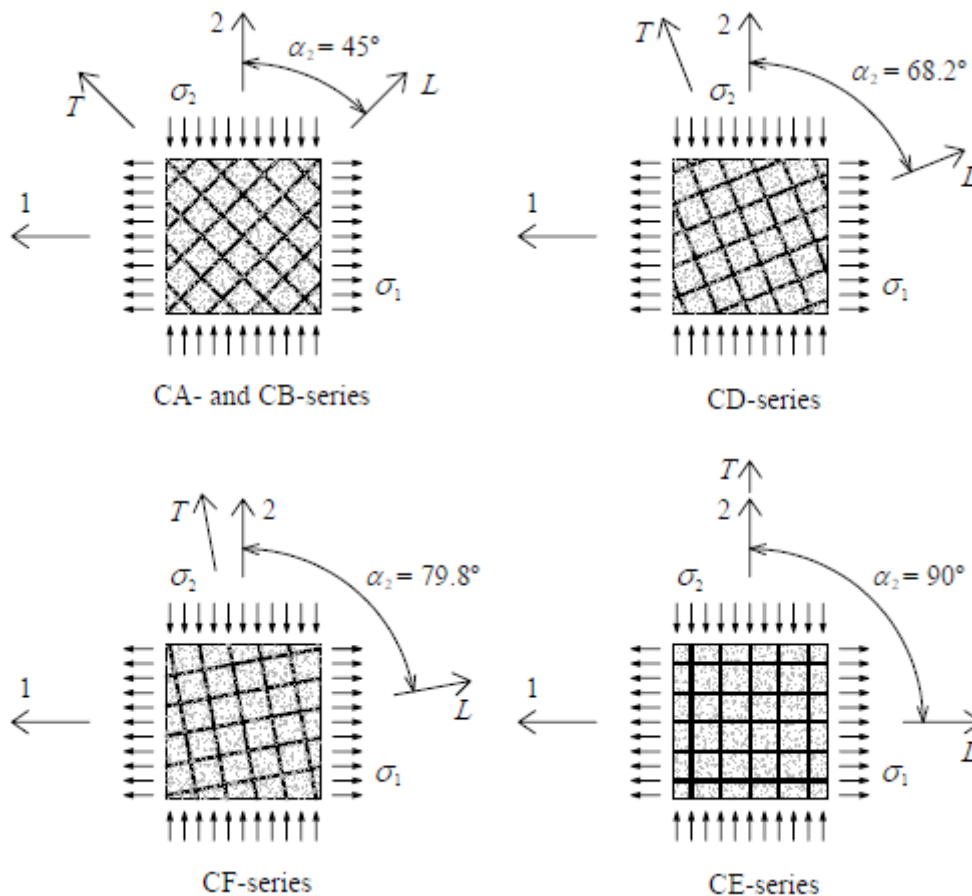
Loading conditions and reinforcement layout of the reference RC panels
